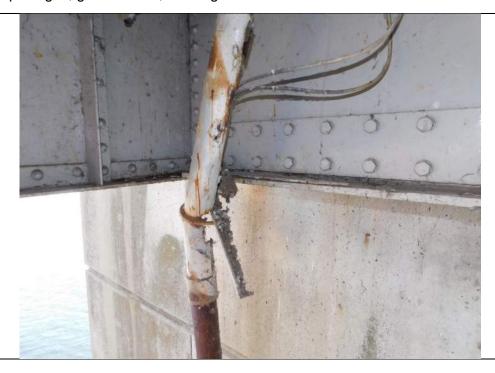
[Span 6] -Electrical conduit exhibits 100% SL and a broken support angle at connection to East exterior FB0S with exposed wiring, Looking Southeast
